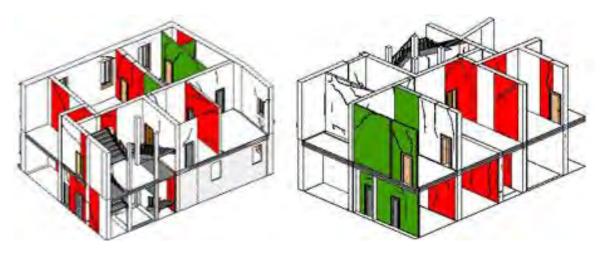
Views of the BIM model of the building, with the passing and non-passing cracks highlighted.
